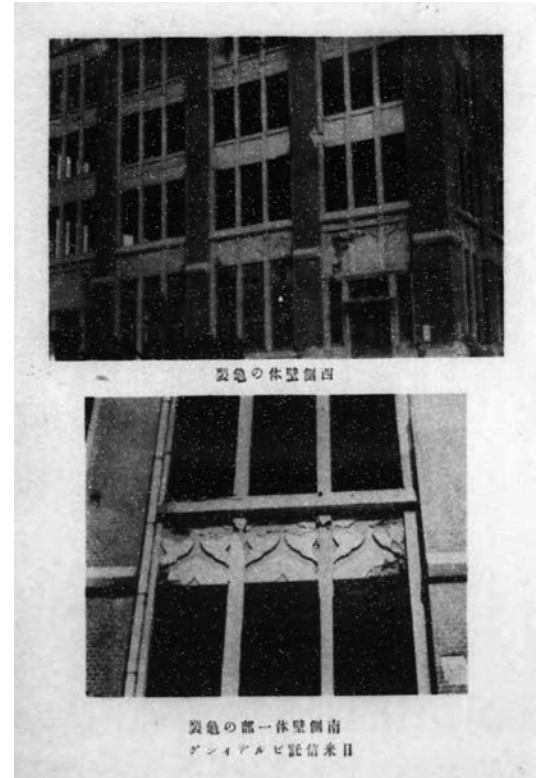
Photos of the damaged facade of Nippon-US Trust Building.
